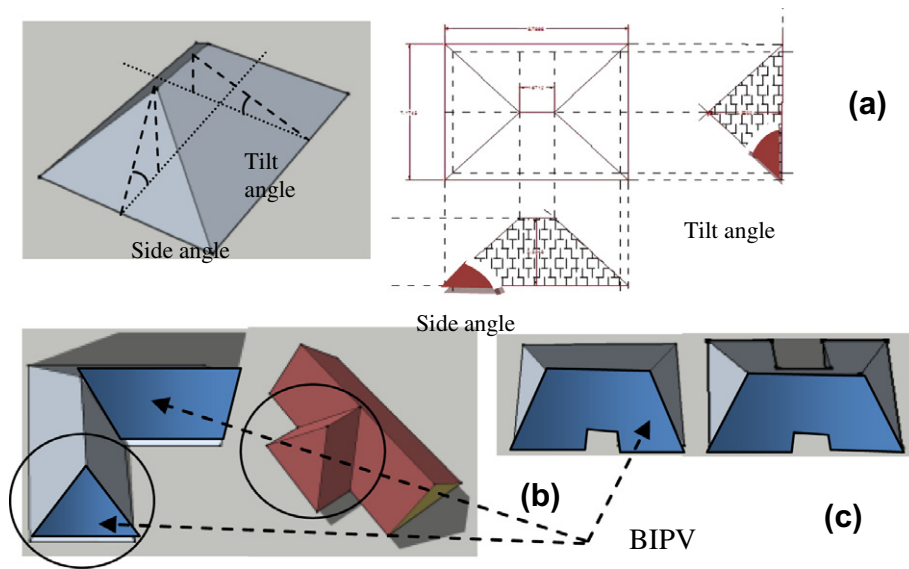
Roof layouts of basic designs: (a) single ridge designs; (b) double ridge designs in L, T; (c) roofs of U and H shapes.
